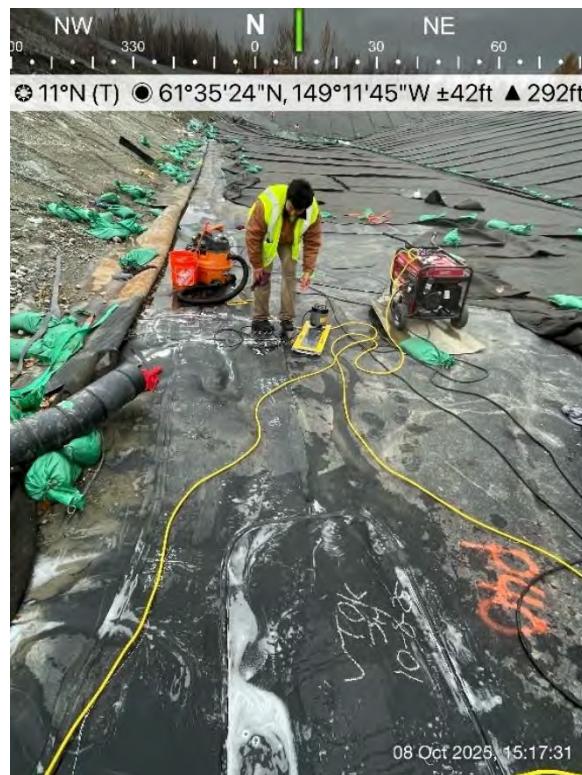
10/08/25 – Non-Destructive Spark Testing of Pipe Boot
